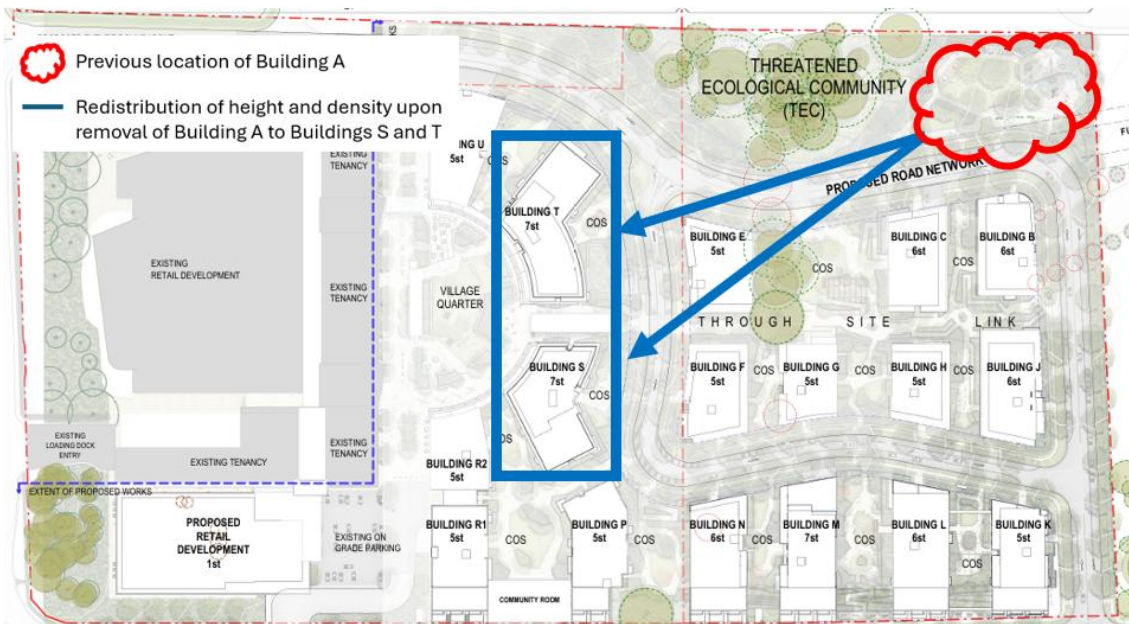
Proposed site plan with redistribution of height (Source: Group GSA)
